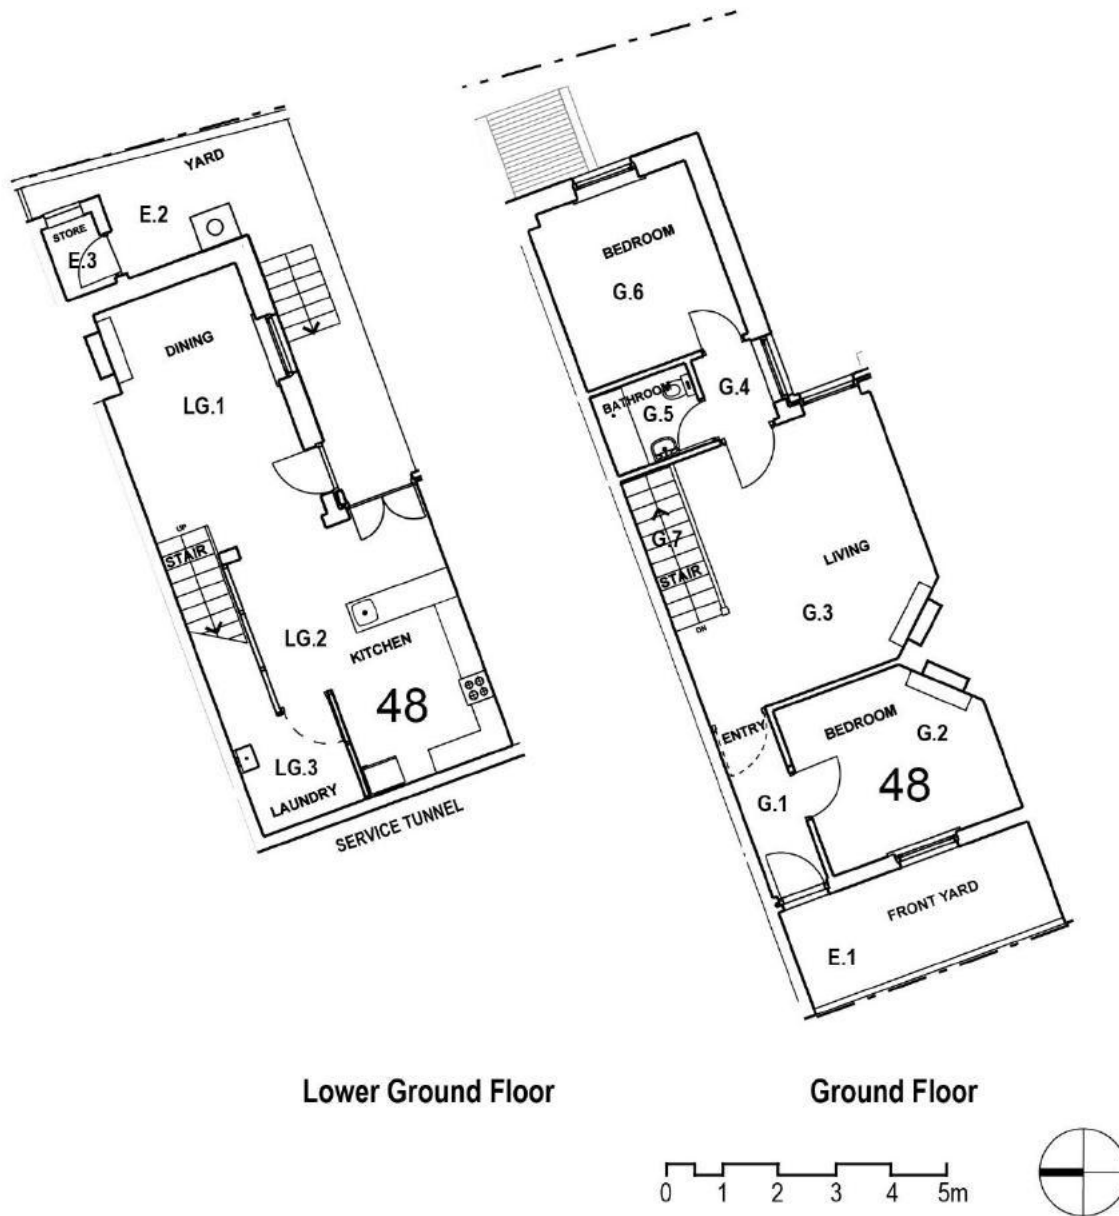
Floor plans of Flat 48 / 46-56 Gloucester Street showing the layout of the flat and space numbers for the ground and lower ground floors. (Source: LAHC, with GML overlay 2016)
